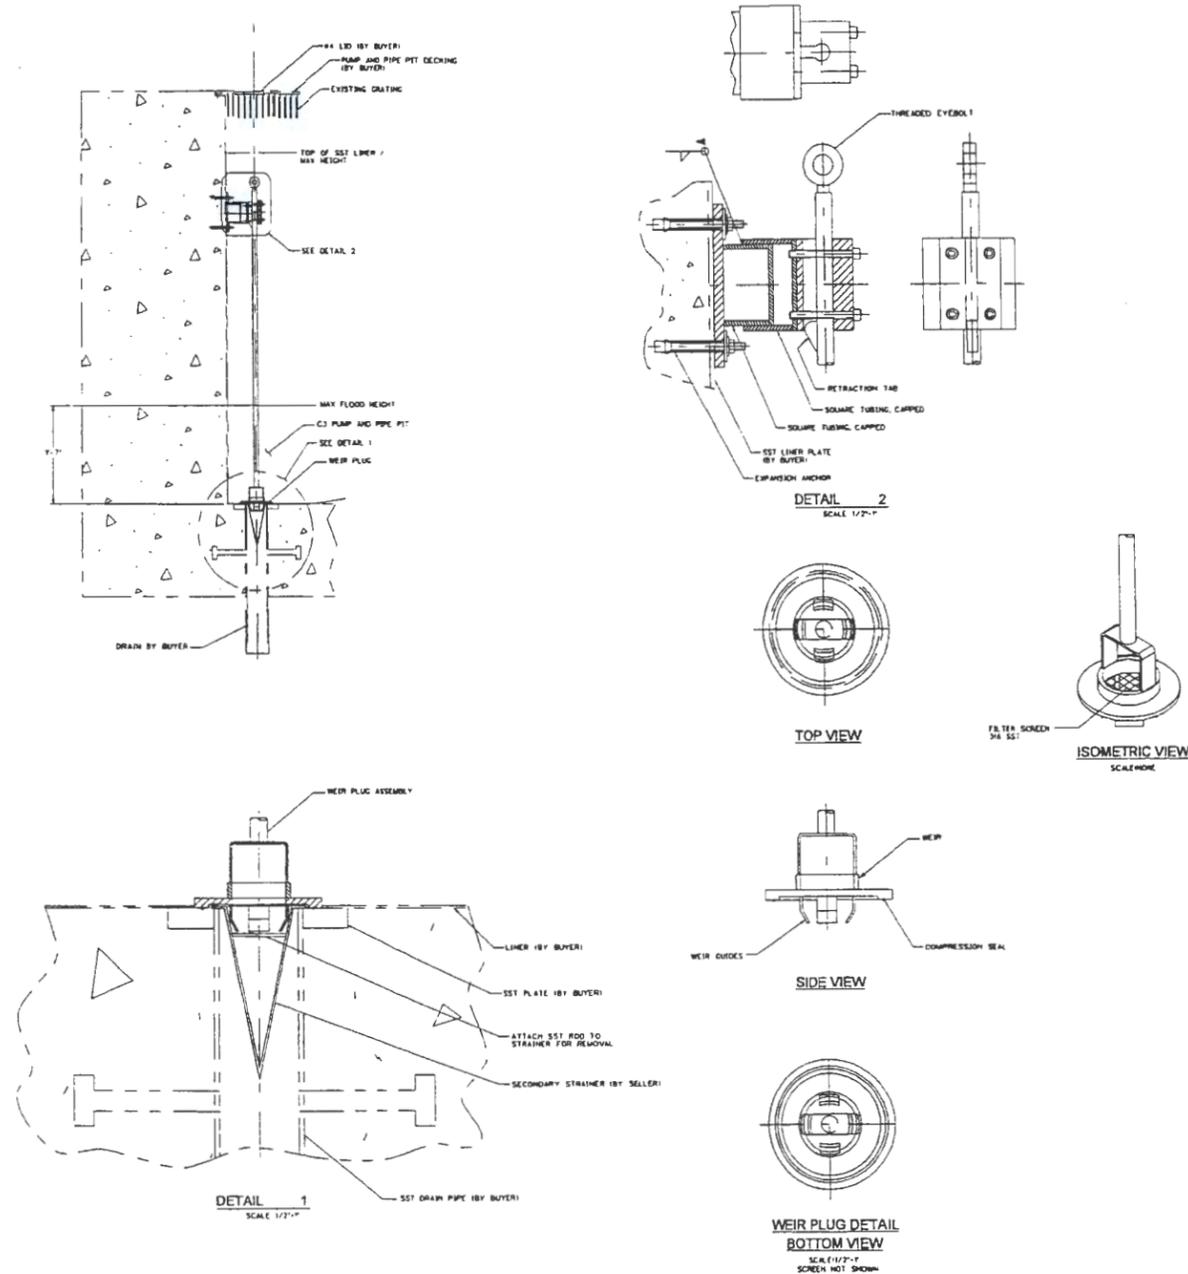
TYPICAL LABORATORY C3 PIPING AND PUMP PIT SUMP AND WEIR DETAILS FOR LAB BUILDING
